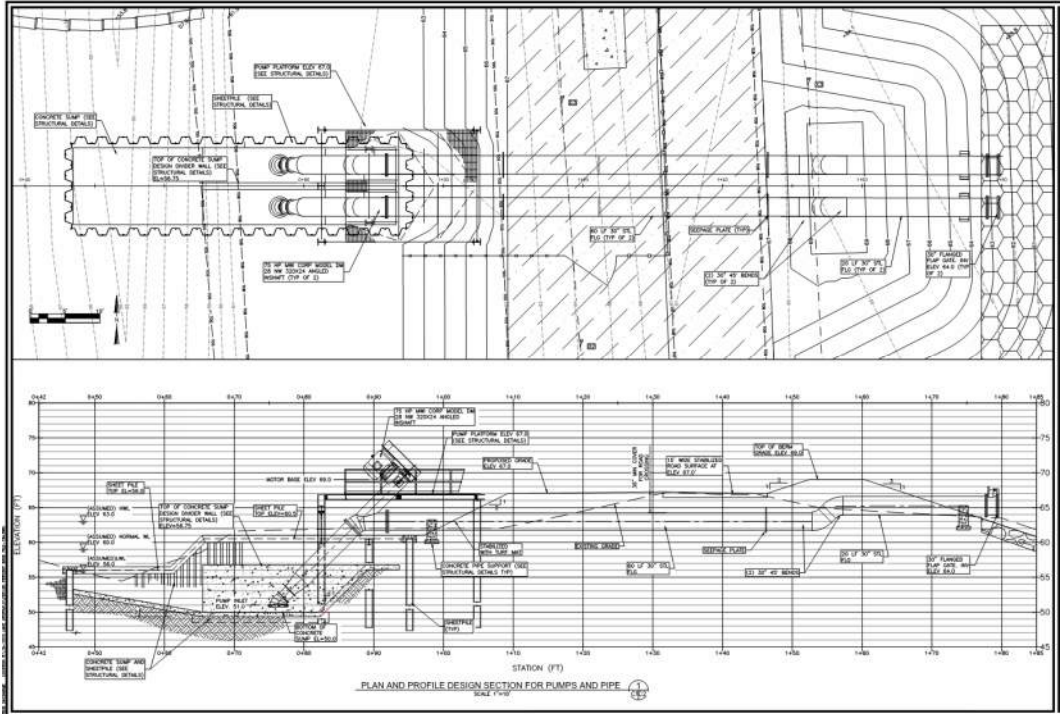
Proposed Plan & Profile Design Section – West Berm
